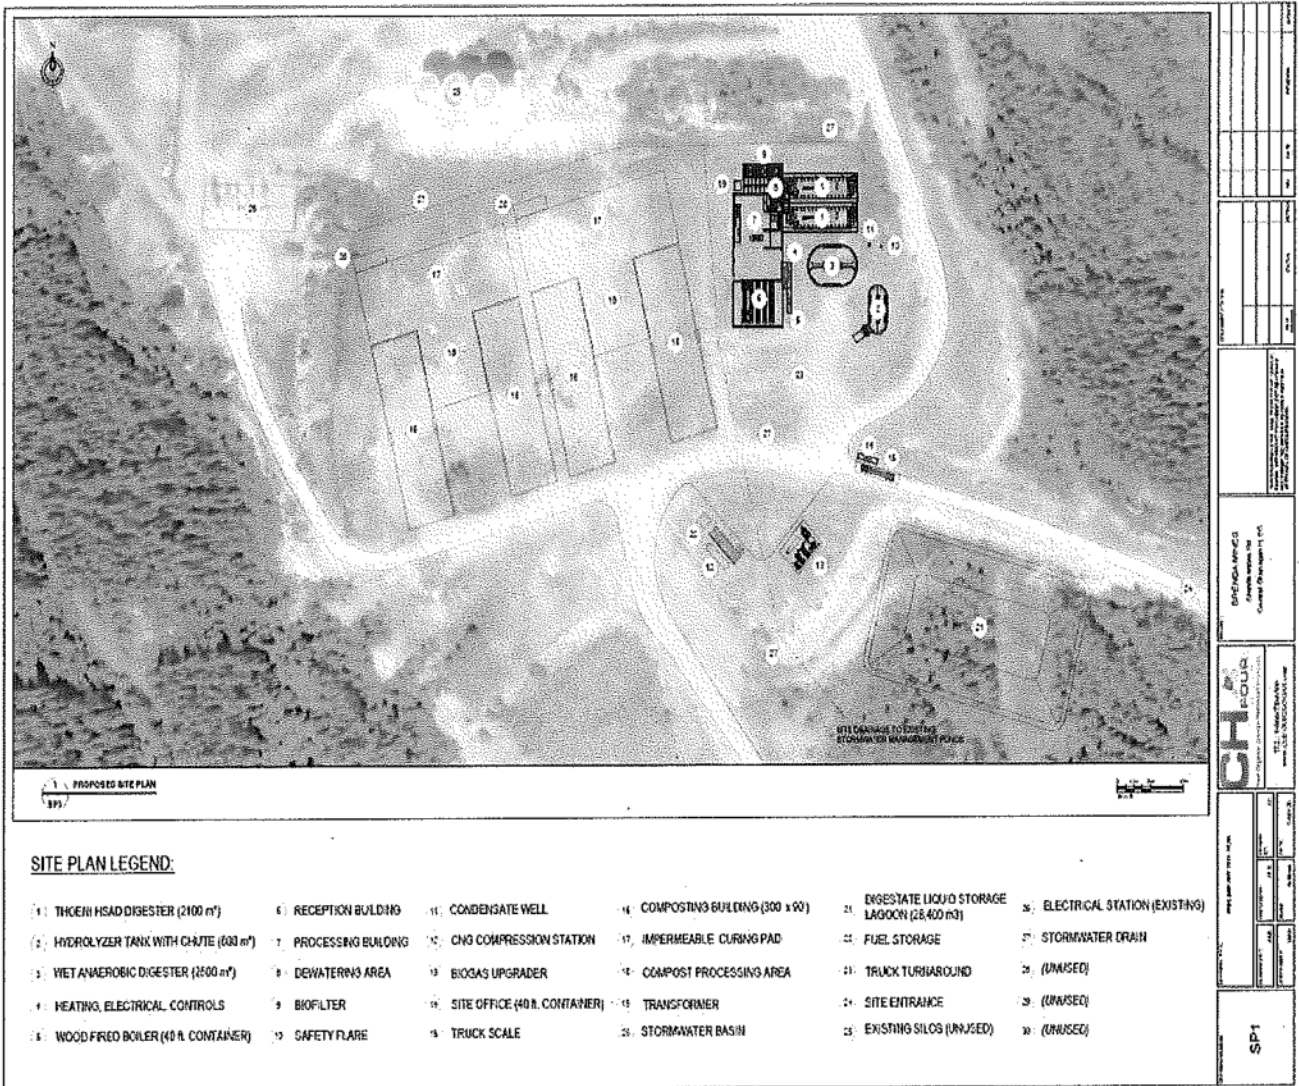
SITE PLAN AND LOCATION OF PRIMARY COMPOSTING BUILDING [300' x 90']
